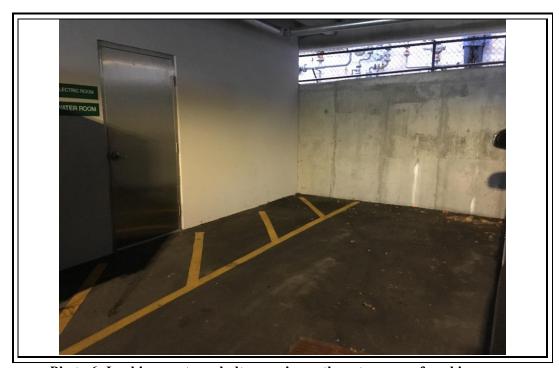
Looking west; asphalt cover in southwest corner of parking garage.
